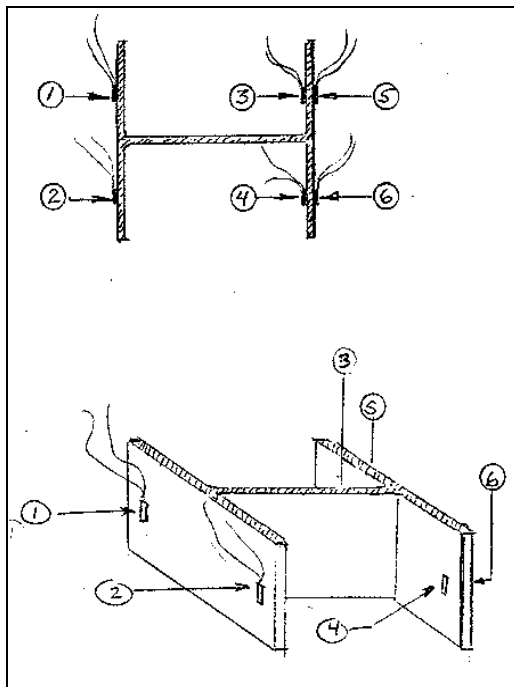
Strain gage layout for compression testing of WF-FRP composite columns.
